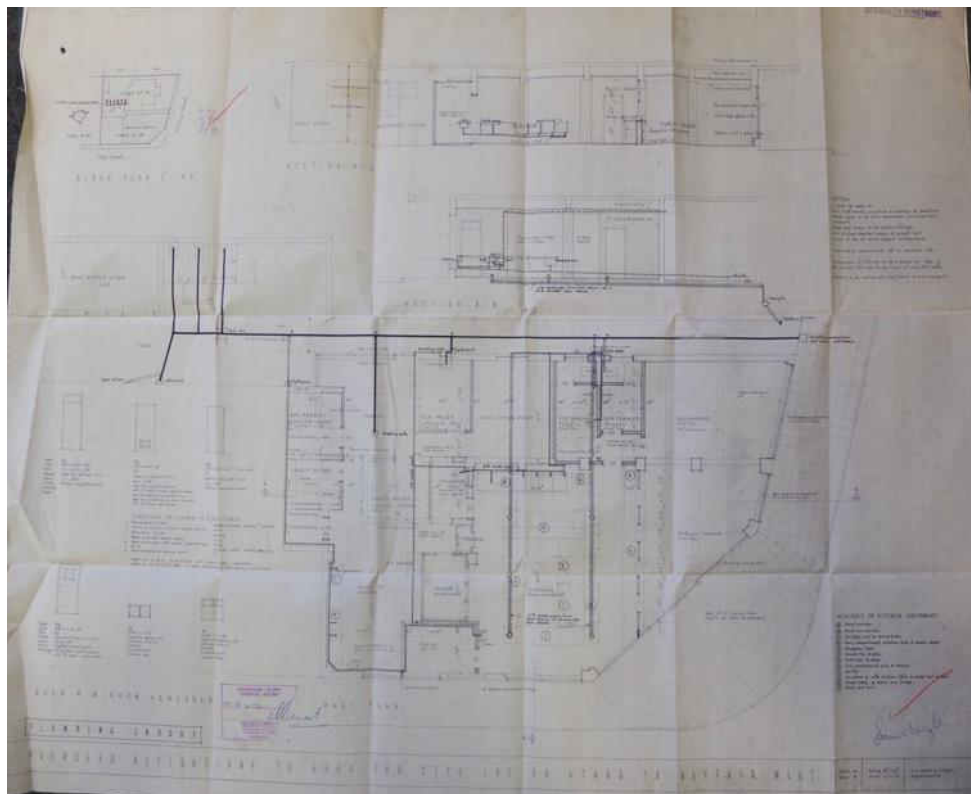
Plan for alterations by J.C. Cook & Cowen Architects from 1971
